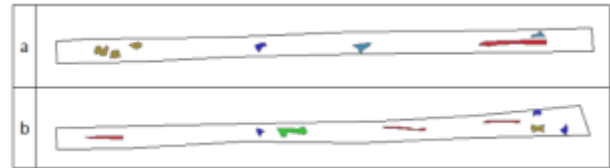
Segmented pavement distress in section 6, Pandoya Bazar Road Moor to Bishmail Gate
